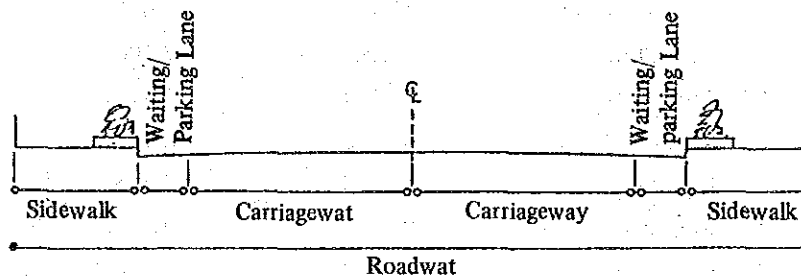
Typical Cross-Section Of A Roadway
